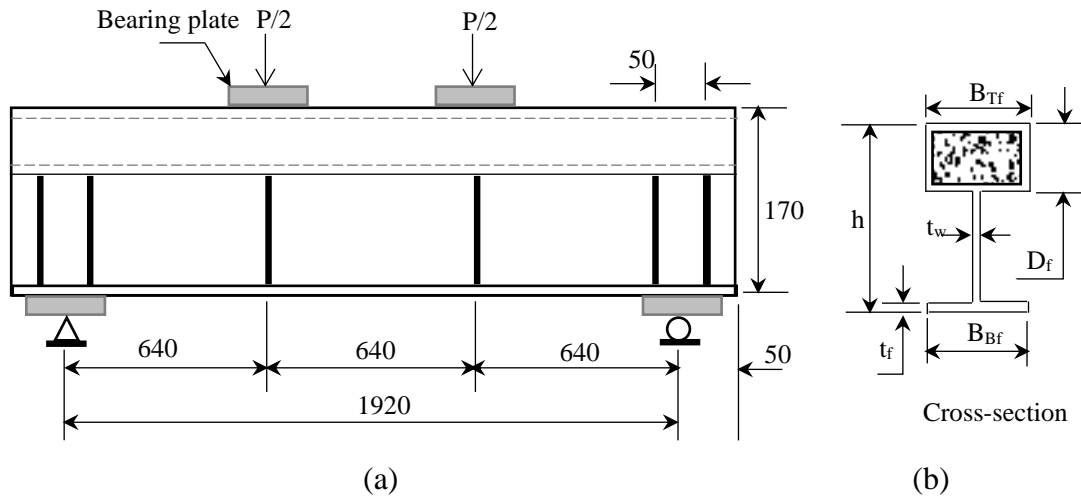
Schematic of the concrete filled rectangular flange girder and cross-section (all units in mm)
